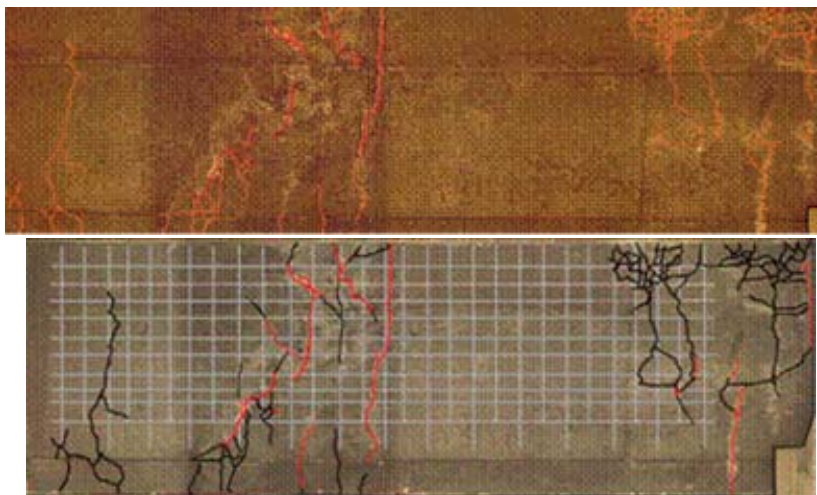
Appearance of concrete bridge slab by digital still camera and mounting other inspected result
